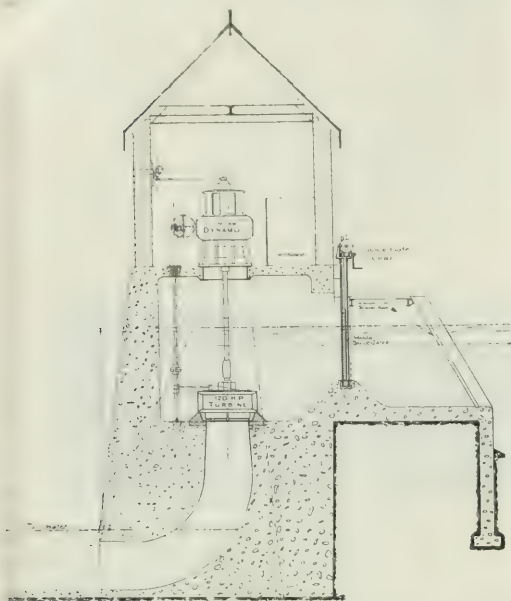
VERTICAL SECTION OF POWER HOUSE AND DAM.
